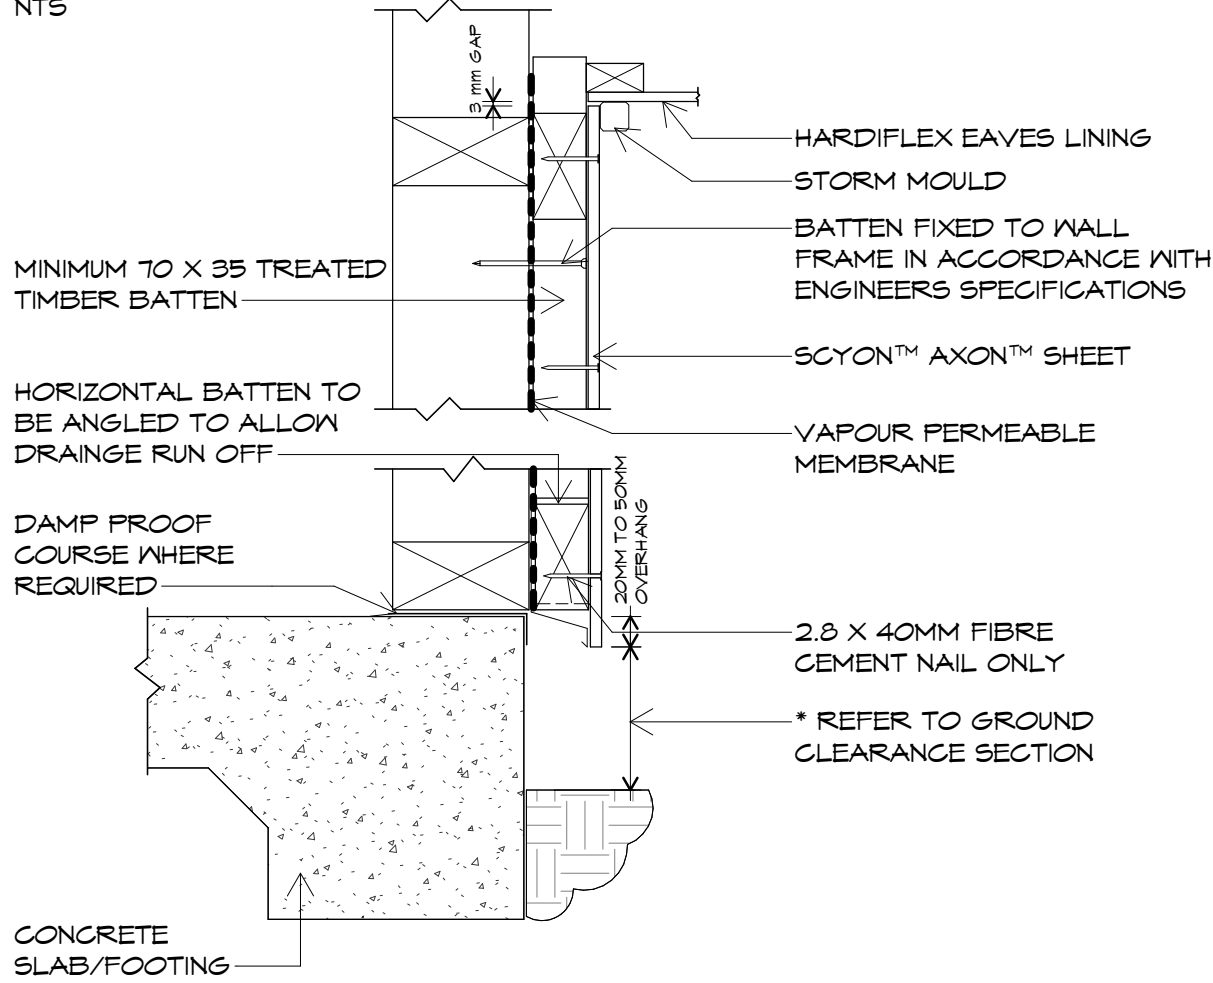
SLAB AND EAVE JUNCTION DETAIL ON BATTENS
